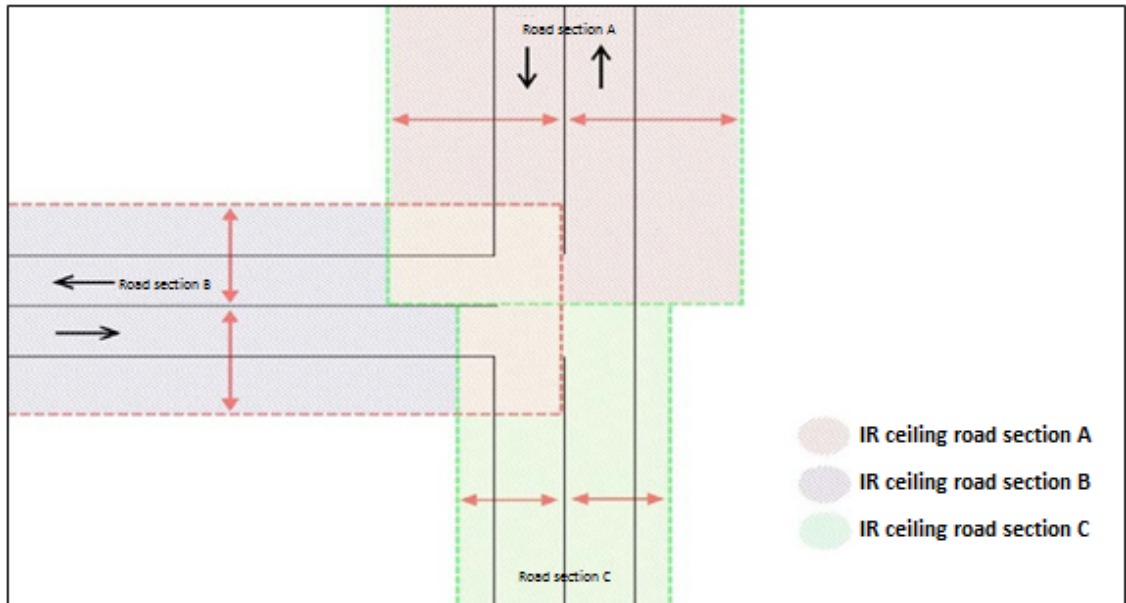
Start and end for a road section at a junction with splitting carriageways
